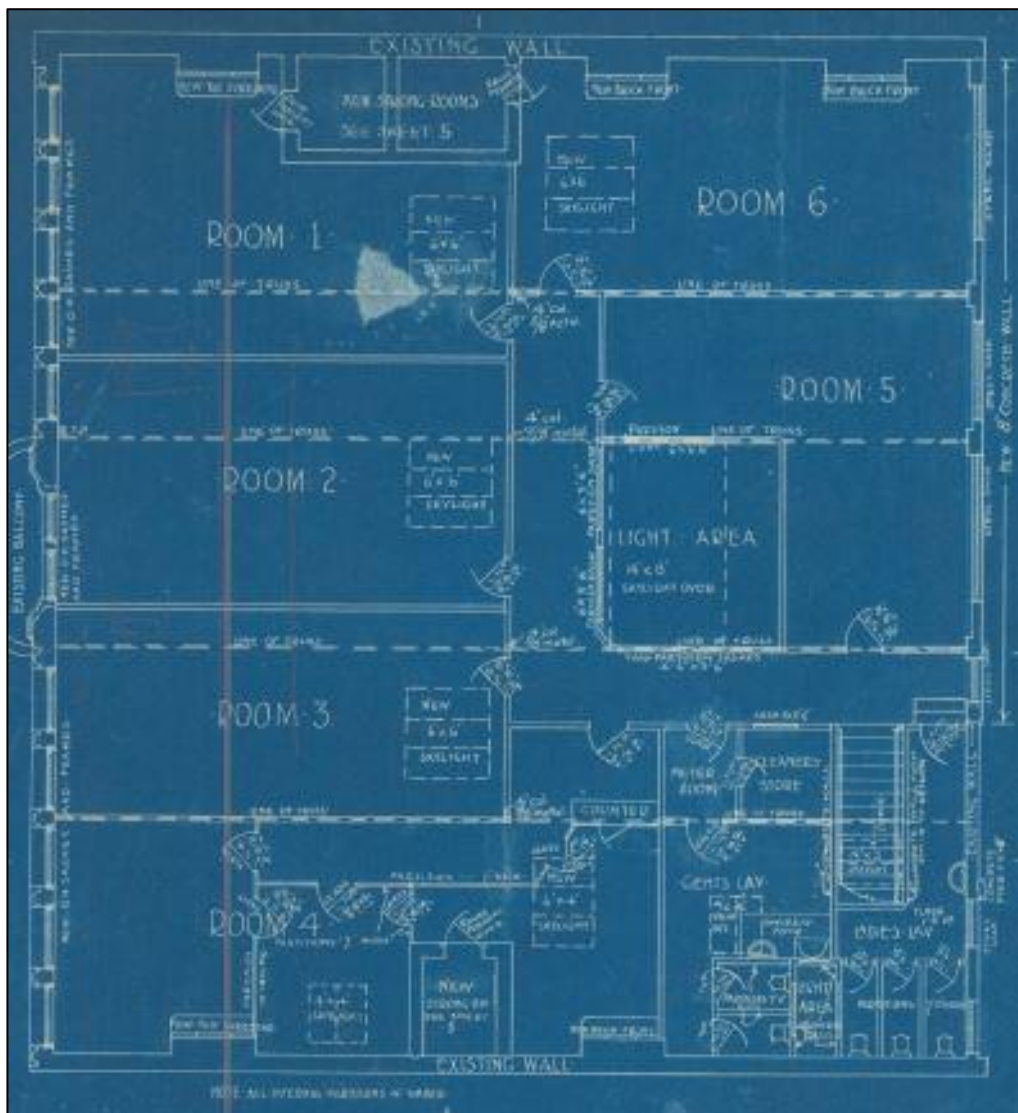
Detail from 1933 plan showing original layout of first floor of Esk Street end of arcade (Esk Street to left) (Ford, 1933).
